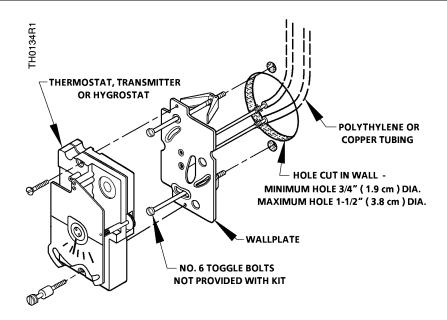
Mounting Wall Plate and Room Transmitter or Hygrostat with Tubing Kit 180-896.
